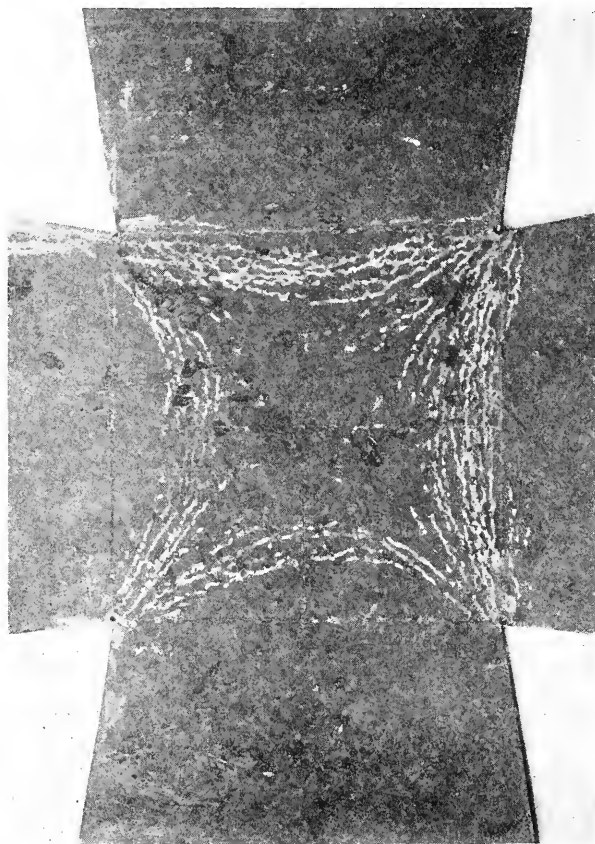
VIEW SHOWING COMPRESSION SIDE OF CROSS-BENDING TEST SPECIMEN AFTER TEST.
